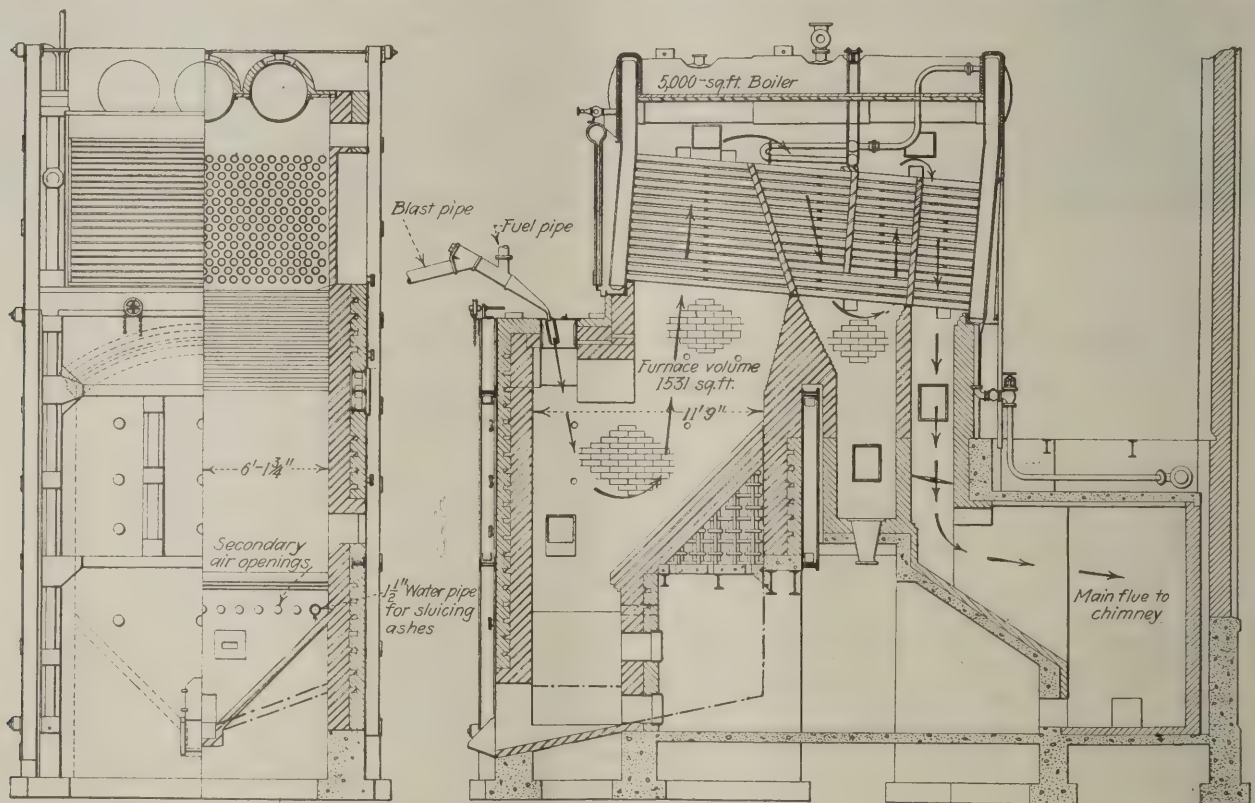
Cross-Sectional View of Boiler, Furnace and Setting
